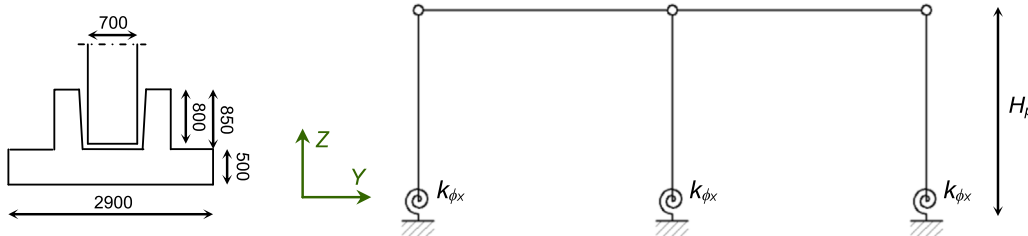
Vertical section of a foundation, and scheme of the structure in the Y-Z plan including relevant elastic rotational springs at the column feet.
